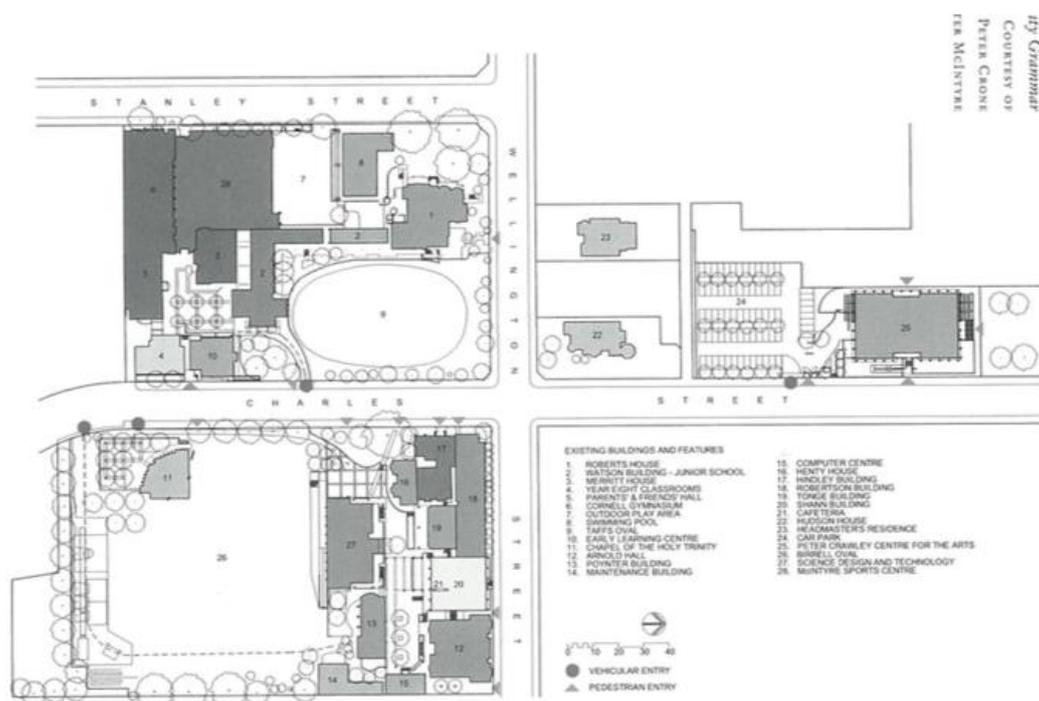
Plan of existing buildings at Trinity Grammar School by architects Peter Crone and Peter McIntyre, c2010. (Source: Carolan 2003b:XII)
